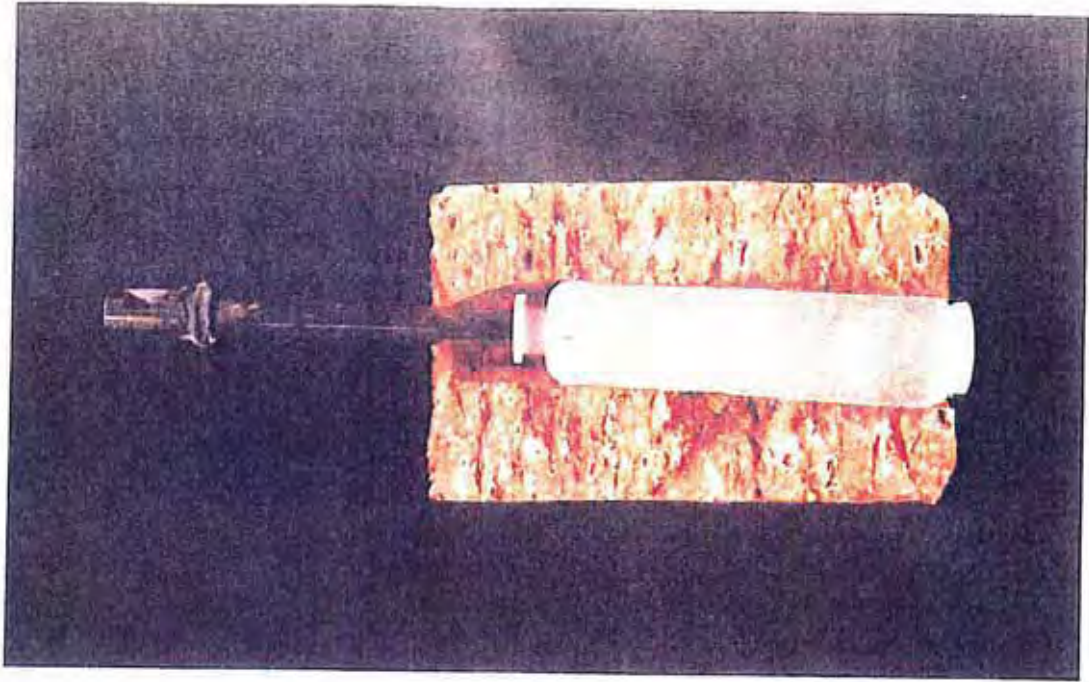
TYPICAL FAILURE MODE FOR THE STANDARD SPECIMEN
